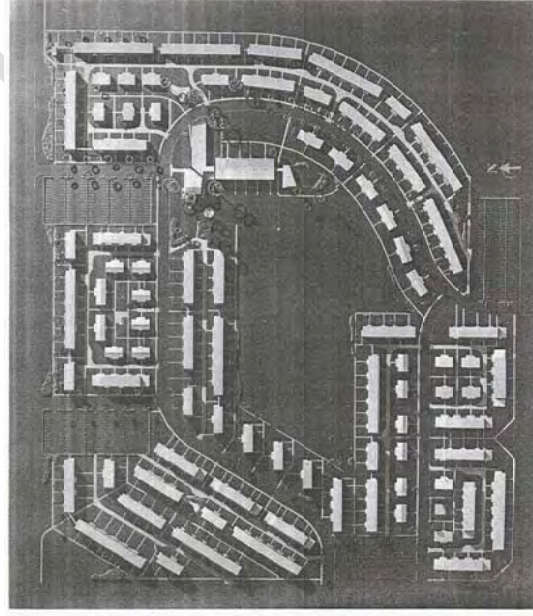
Site plan of Sunnydale, in San Francisco. Source: *Architectural Forum*, June 1942.
